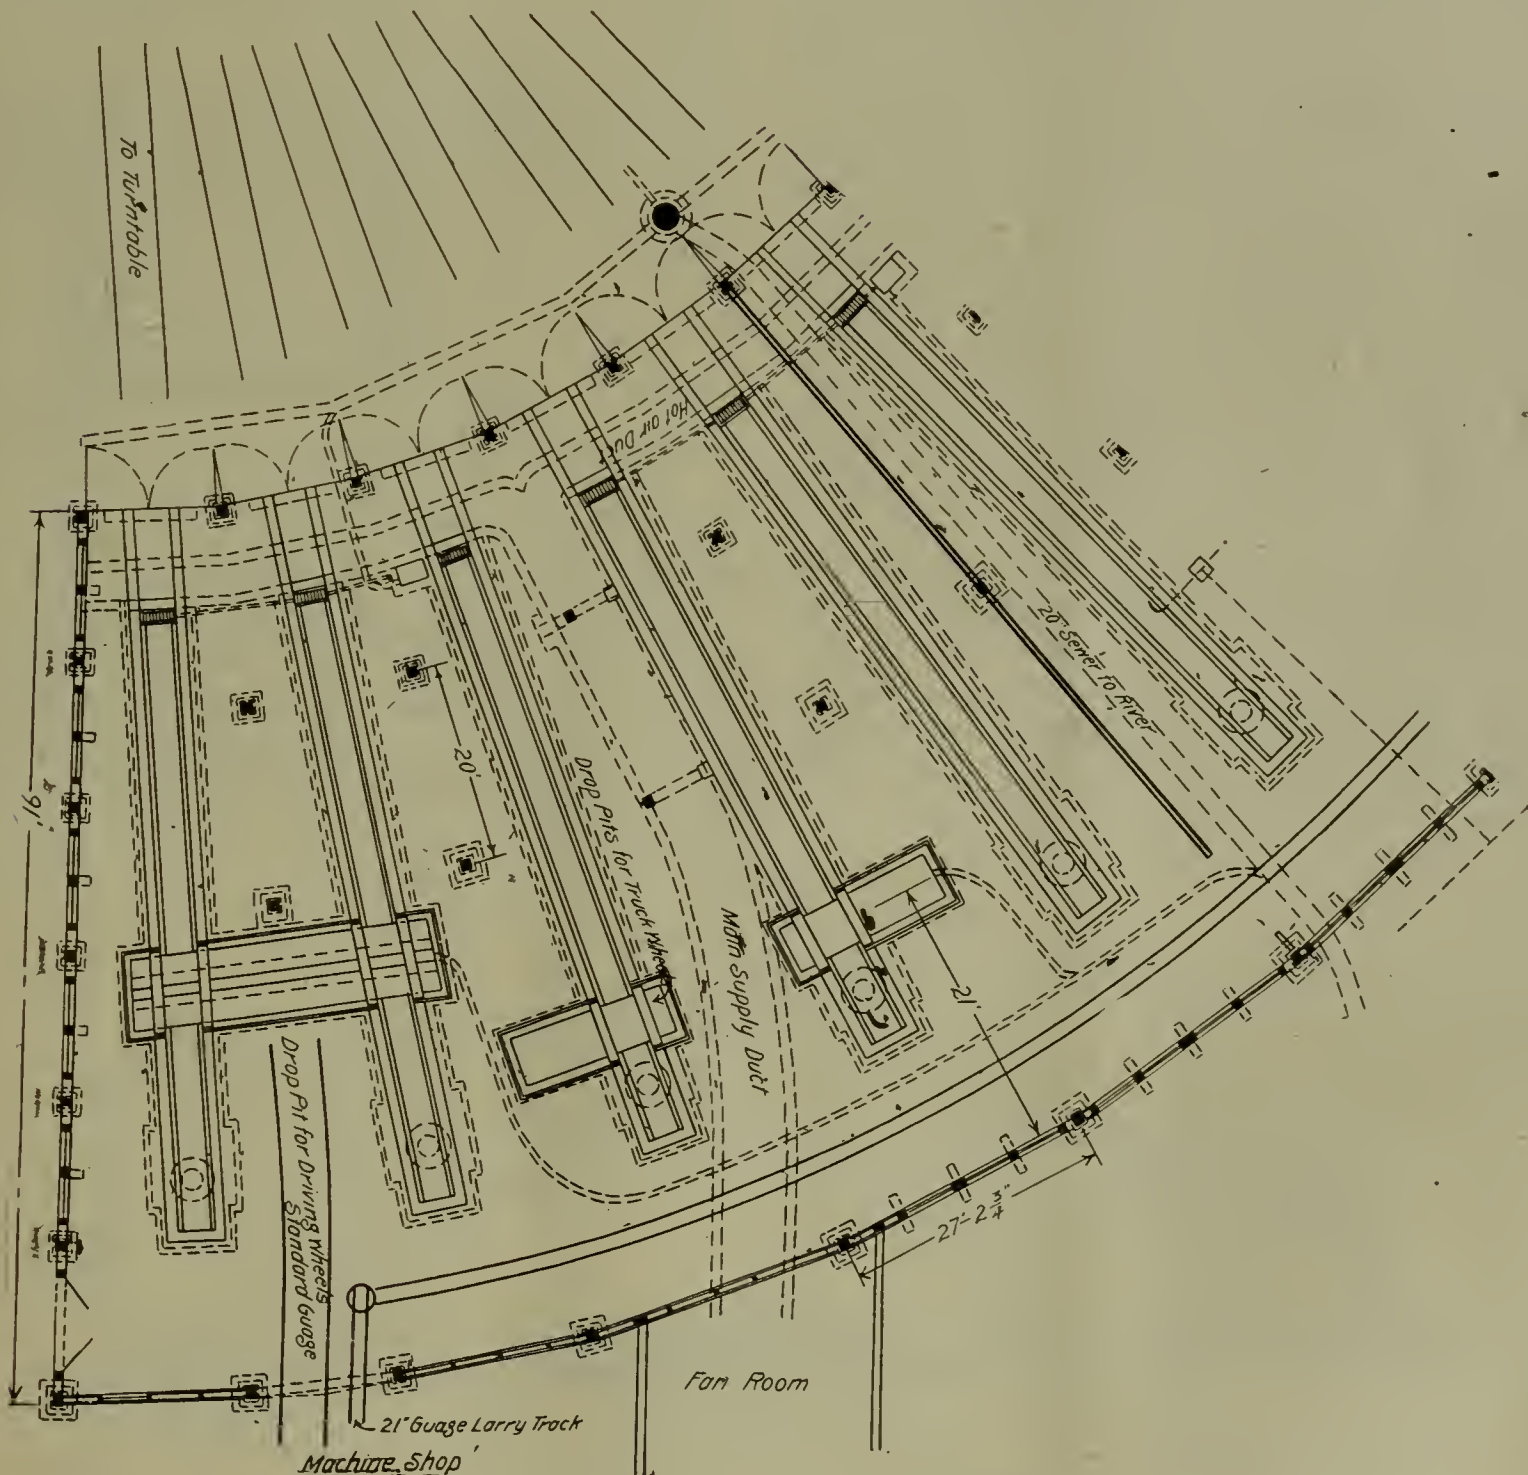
PARTIAL PLAN OF ROUNDHOUSE.
